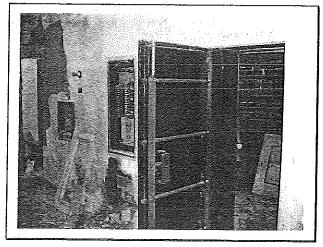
Viewing black vault door, 1st and 2nd floor.
